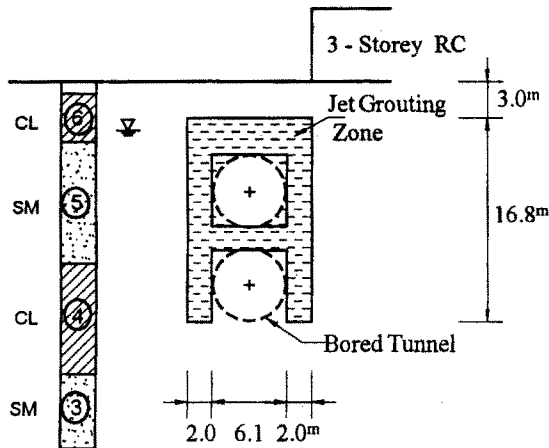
Typical cross-section for jet grouting Areas I and II
